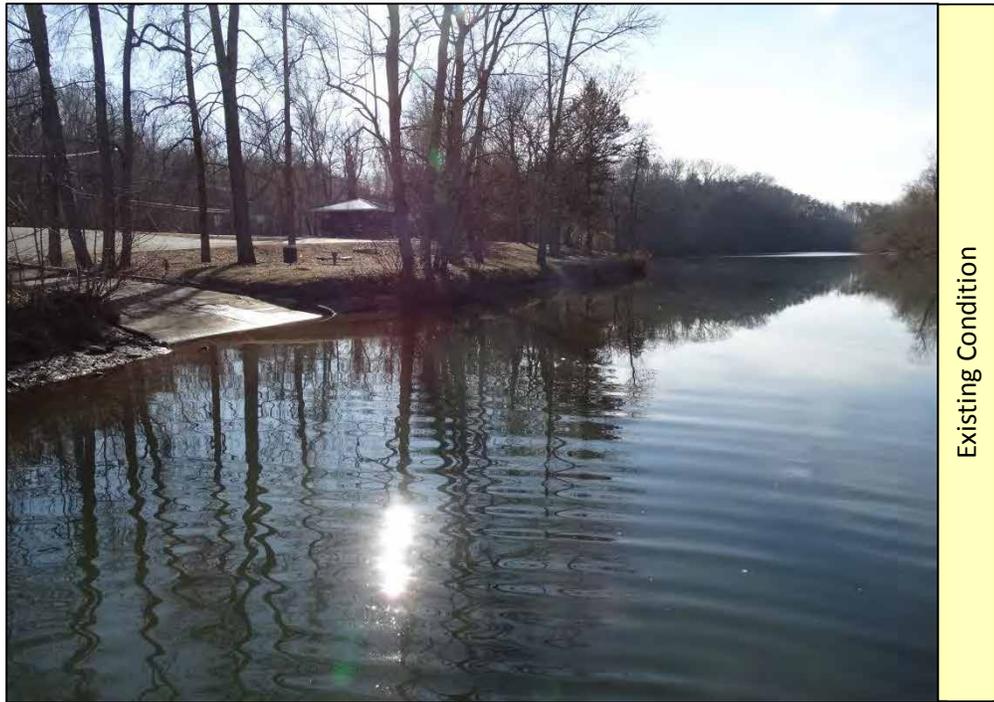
Existing boat ramp. Courtesy dock and connecting sidewalk to be added.
